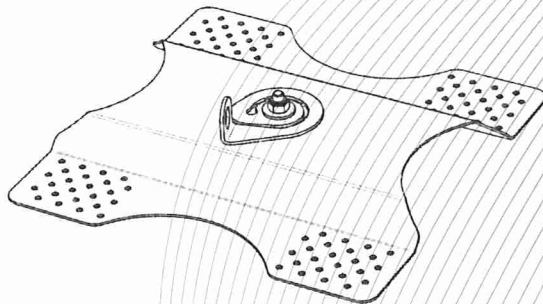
Anchor device, type: STEELFIX EVO Roof Anchor with elongation element
